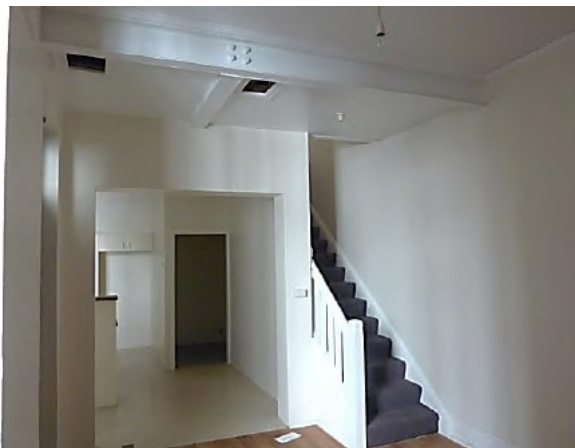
The dining room (space LG.1) showing the opening created in the brickwork to the kitchen and modern partition wall dividing the laundry—48 / 46–56 Gloucester Street. (Source: GML Heritage, November 2015)
